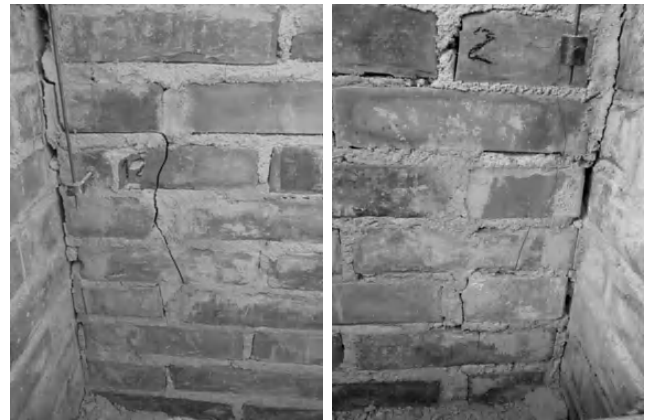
Crushing of masonry in unstrengthened wall: left and right side near foundations
